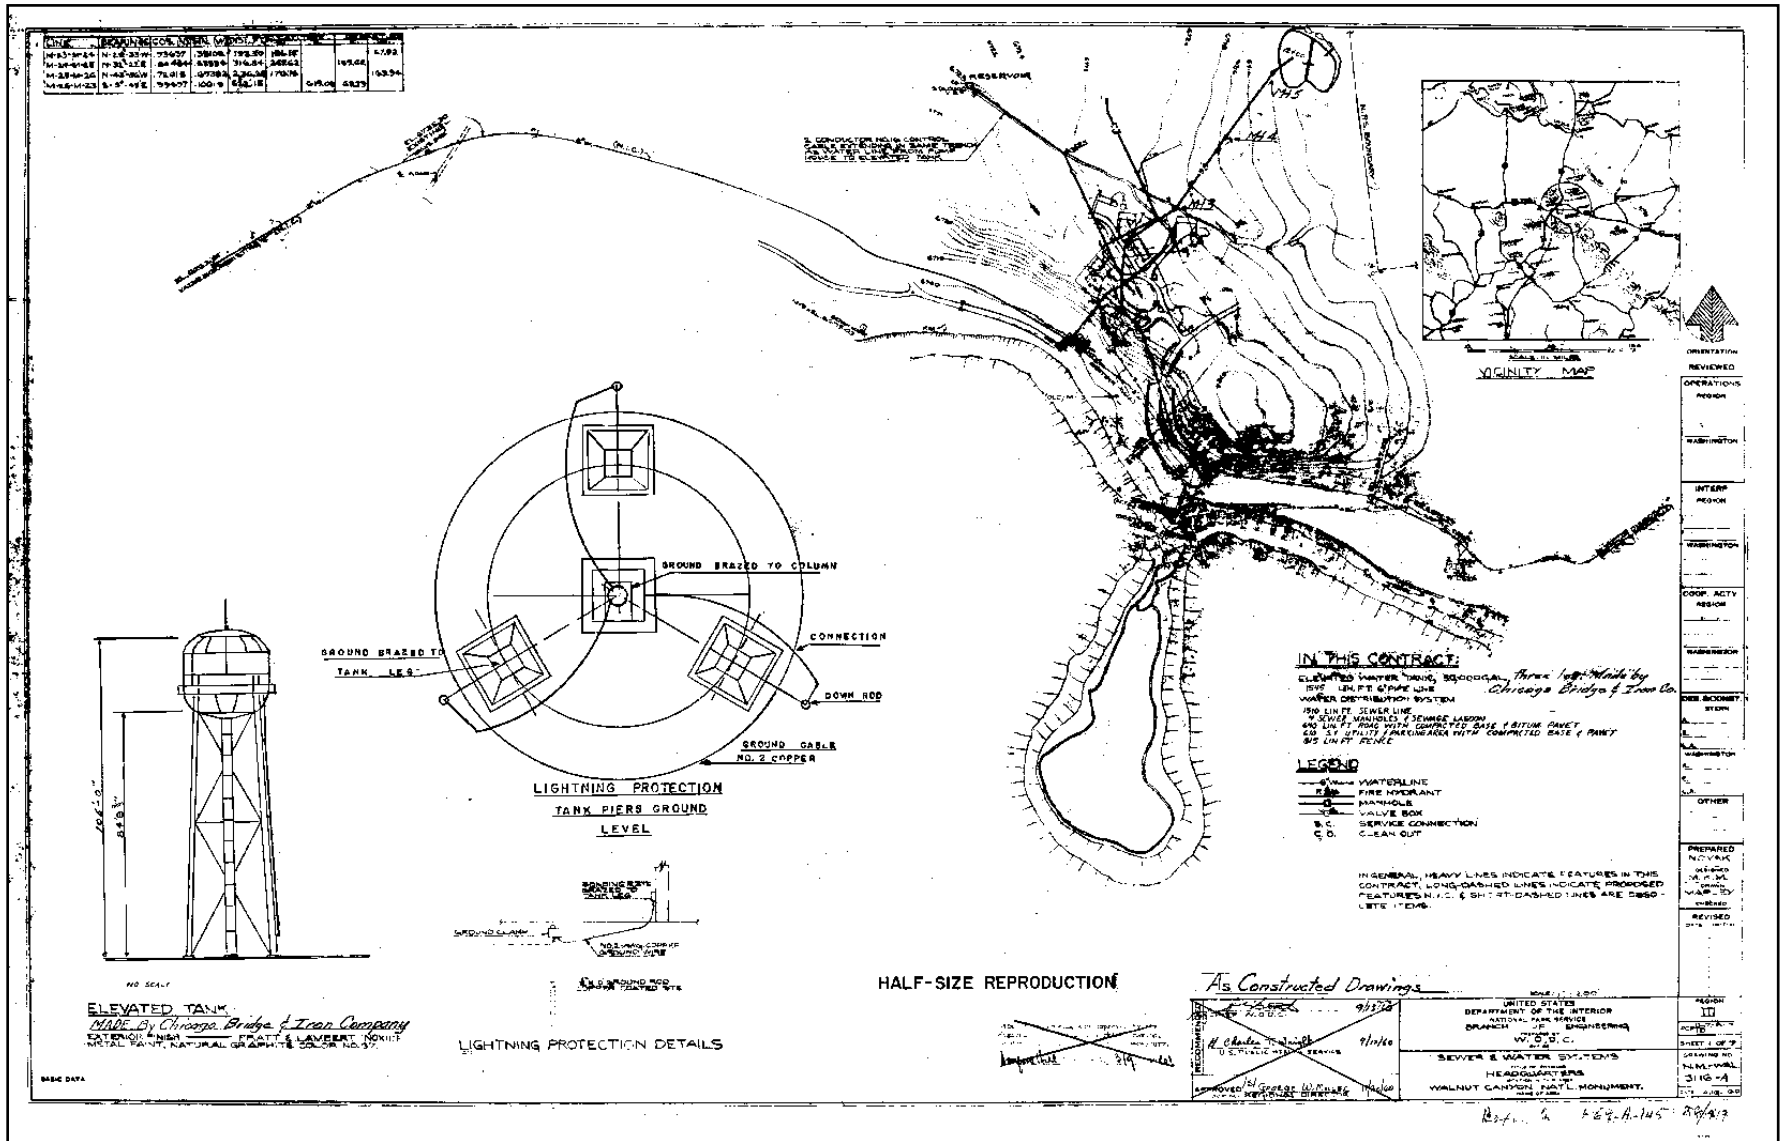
As constructed drawings (NPS Dwg NM-WAL 3116A) for elevated water tank, 1960-61.
